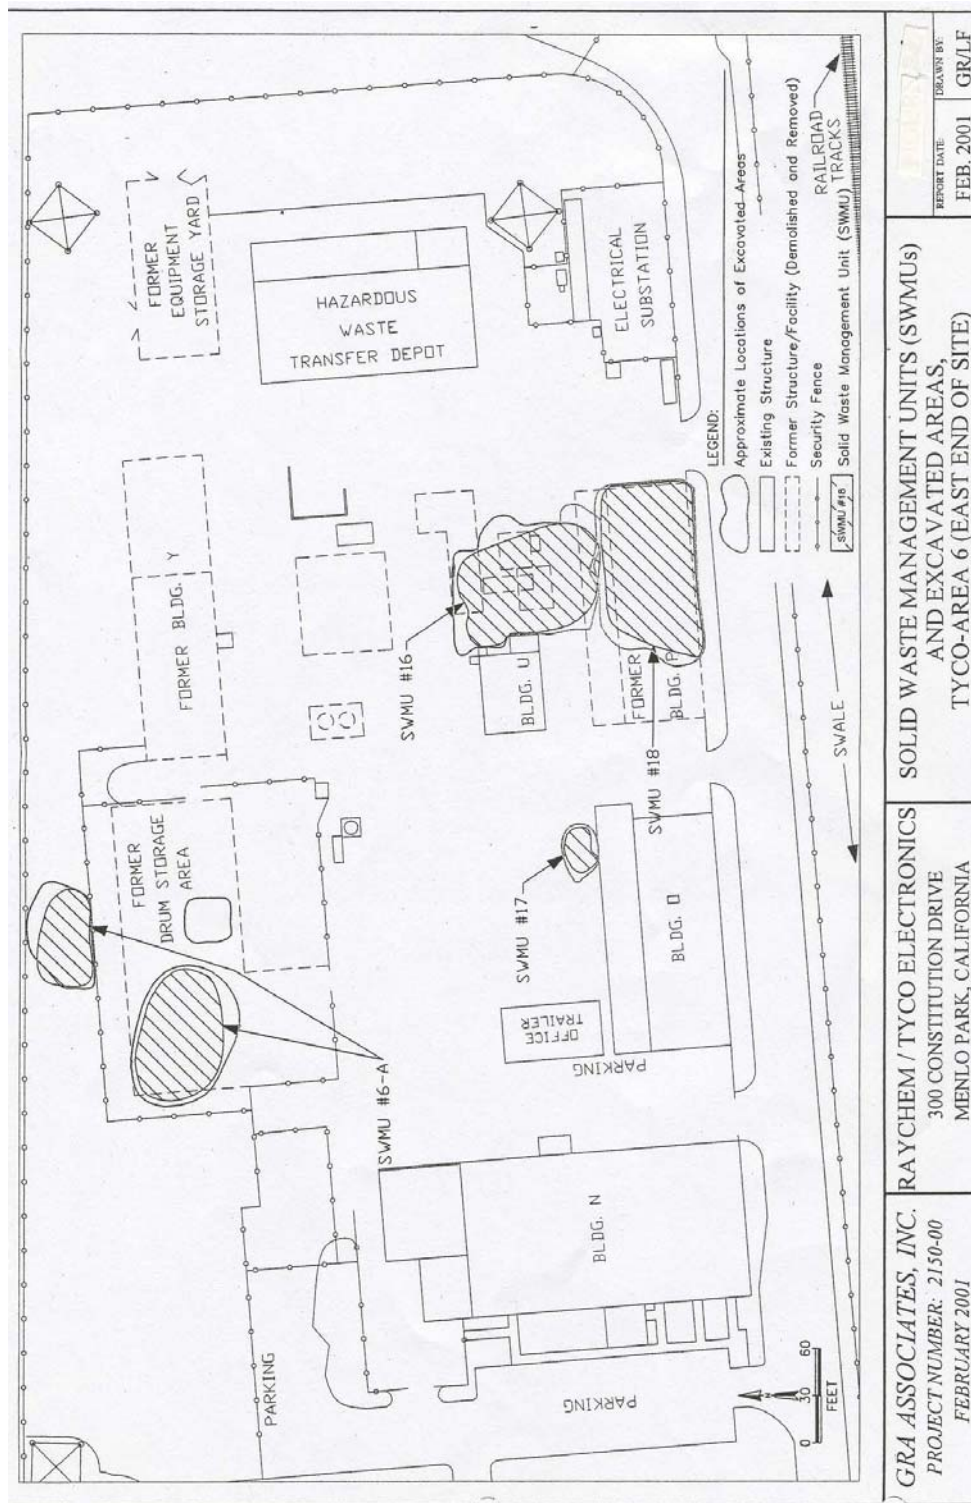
Site Plan Showing Interim Remedial Measure Excavation Areas
